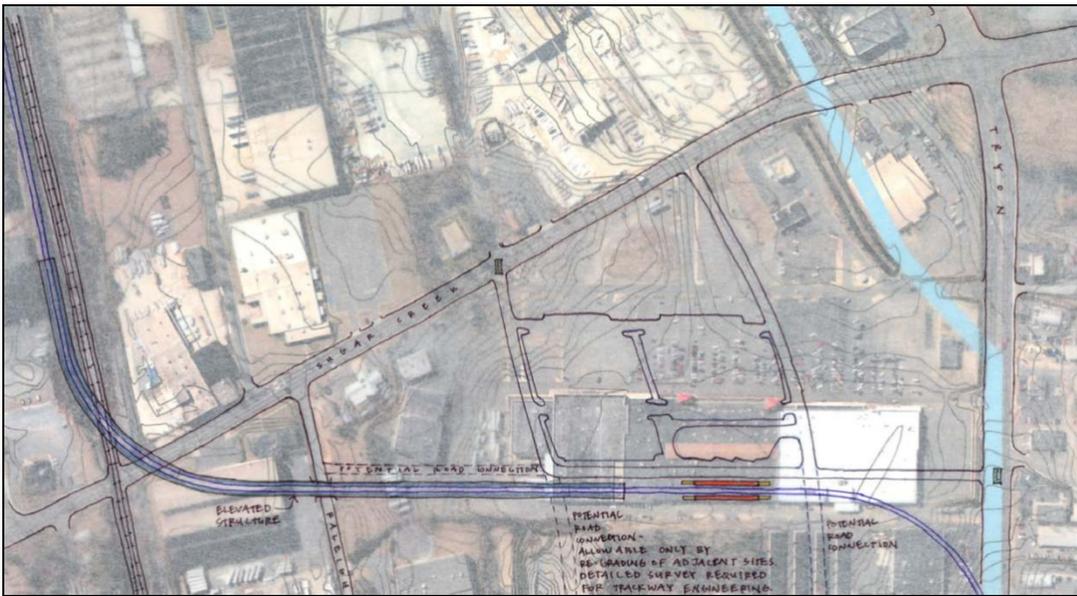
, Eastway Station Site Plan, Sugar Creek Design Option
